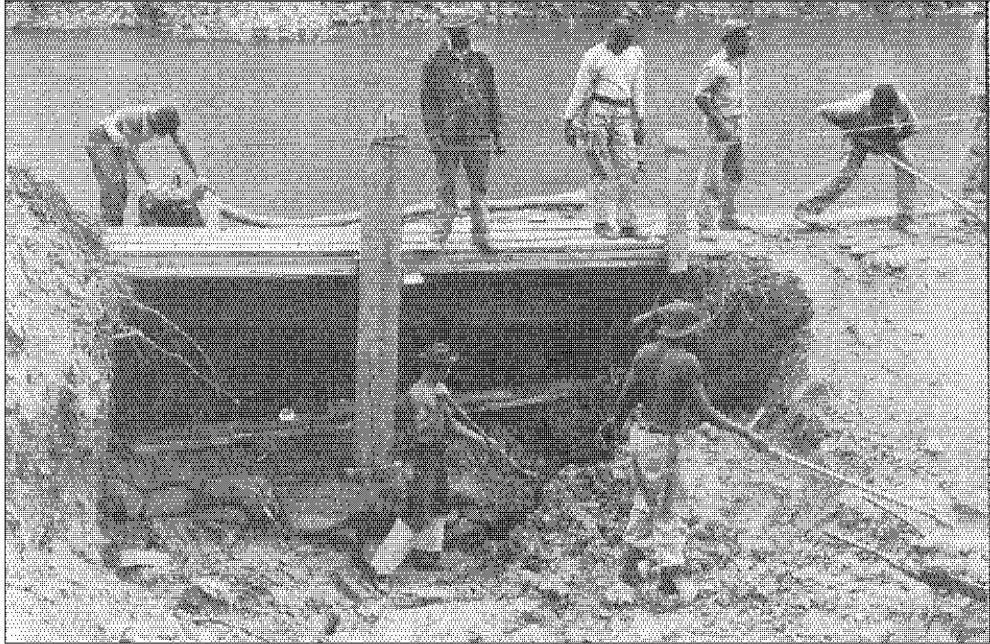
“CCC Repairs Towpath Break at Widewater, September 10, 1940.”
